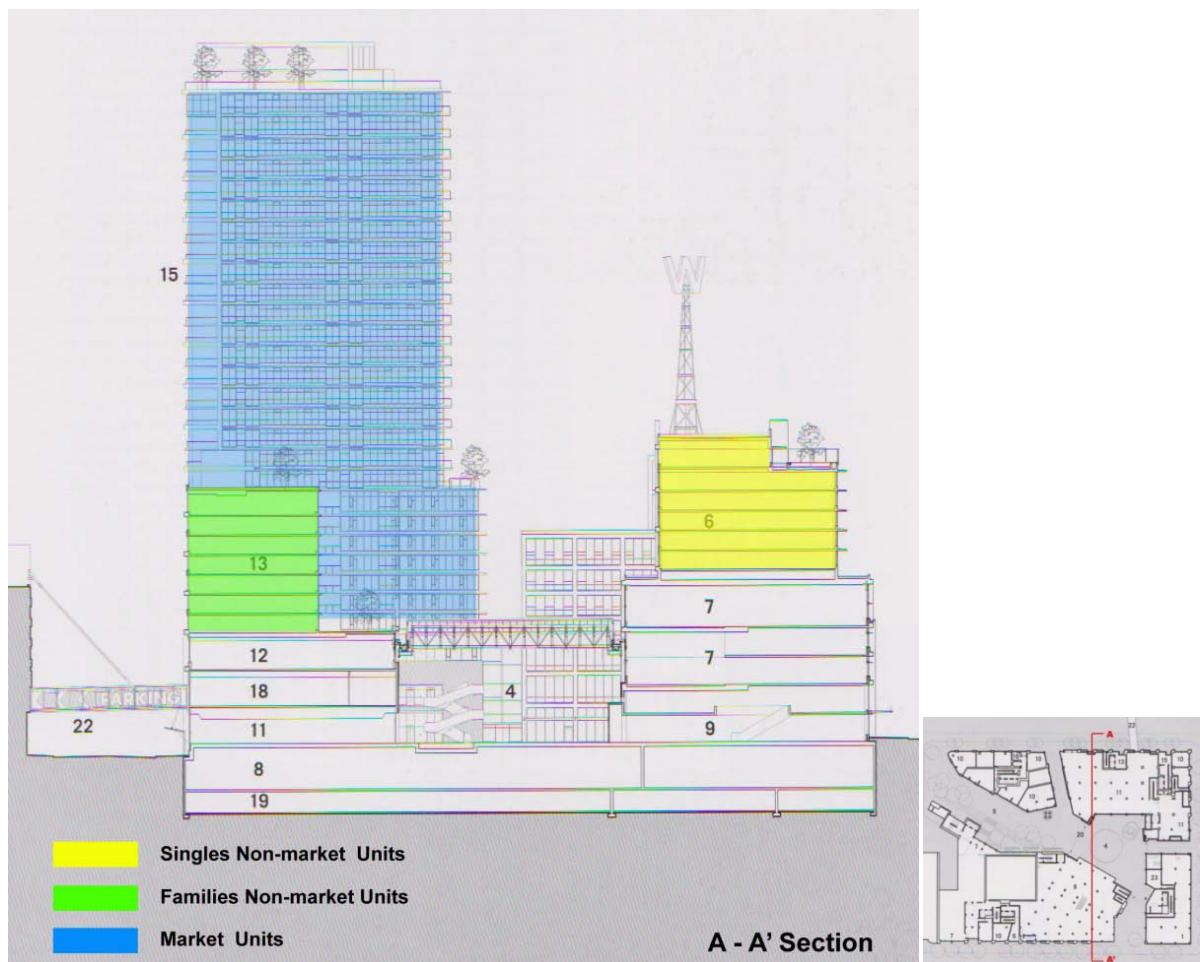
North-South Section and Ground Floor Plan (After: Enright, 2010).
